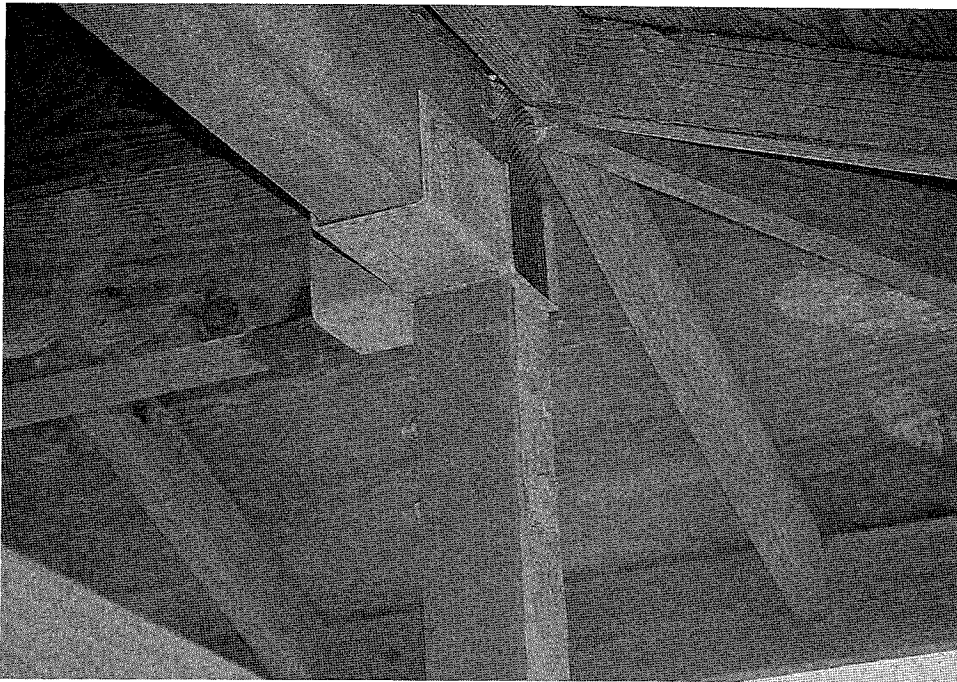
This roof beam connection to a column provided resistance against uplift and also created a stiff joint for lateral forces.
